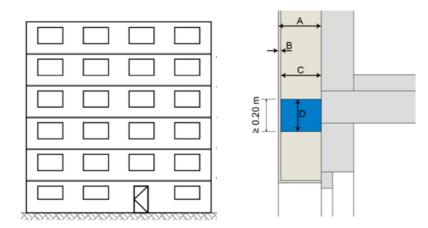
Wall Insulation "Fire Breaks" (a) Front view and (b) Section view. Source: VKF AEAI Directive 14-15 Use of Building Materials [43]
